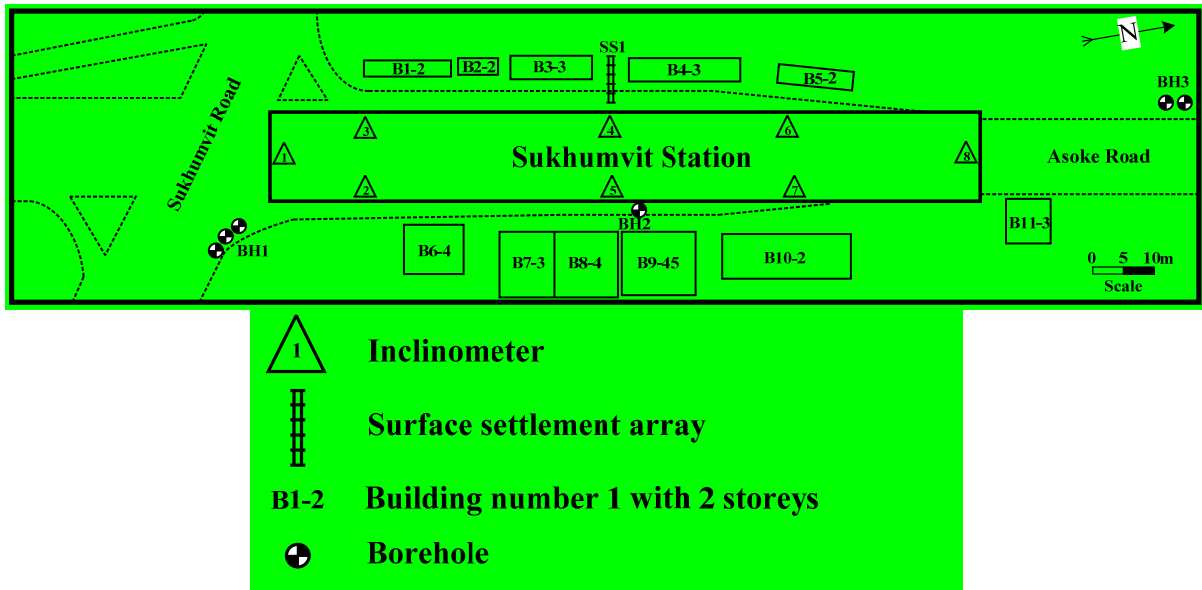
Plan view of the Sukhumvit Station and its instrumentations
